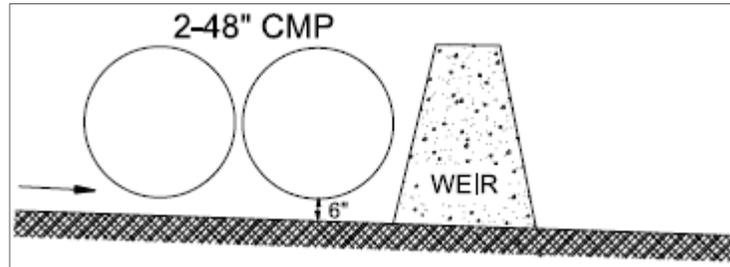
Longitudinal Cross-Section View of Inflow Structure
